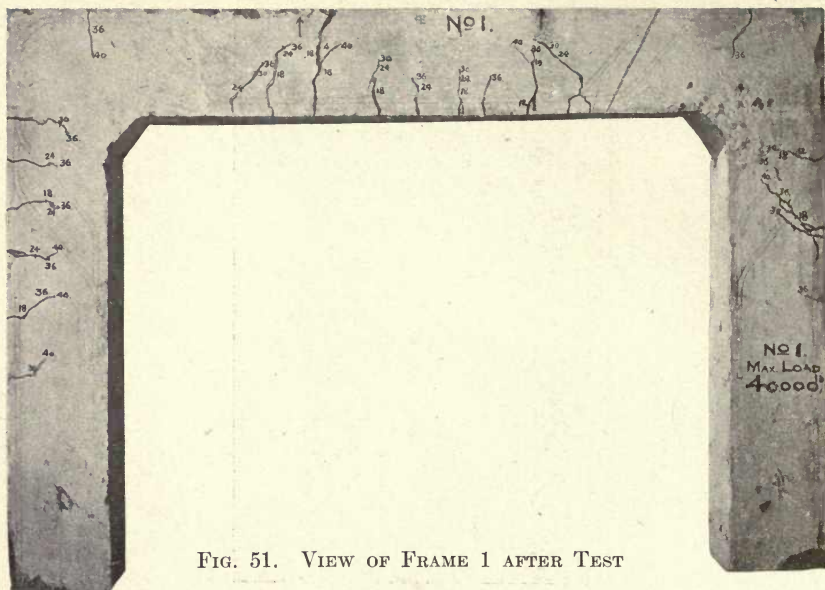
VIEW OF FRAME 1 AFTER TEST
